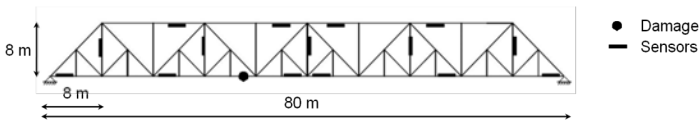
A 80-m railway steel truss bridge with sensors and damage locations.
